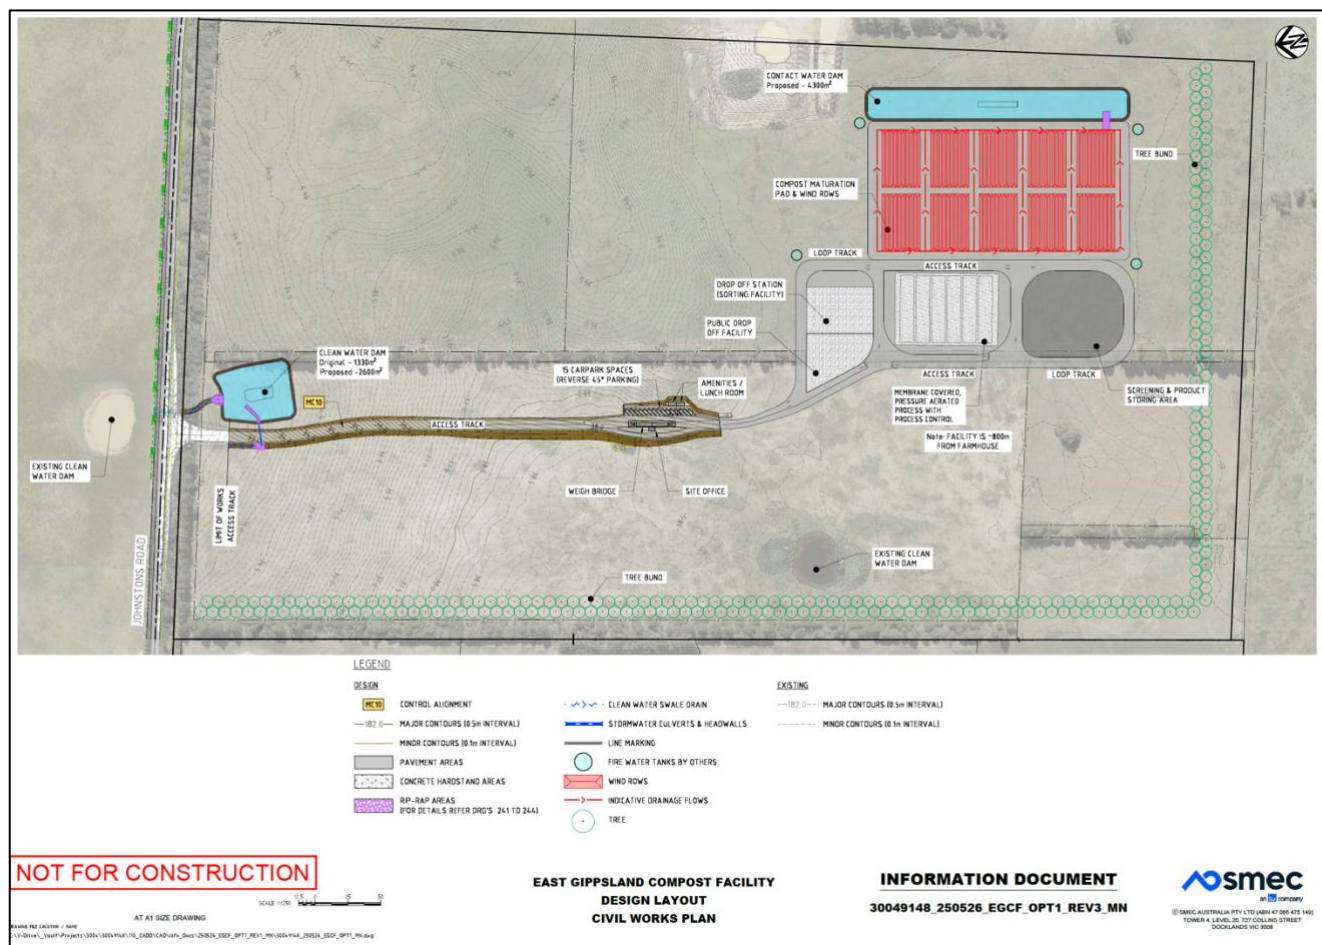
The finalised site plan, (Source: East Gippsland Shire Council plans, completed by SMEC)
